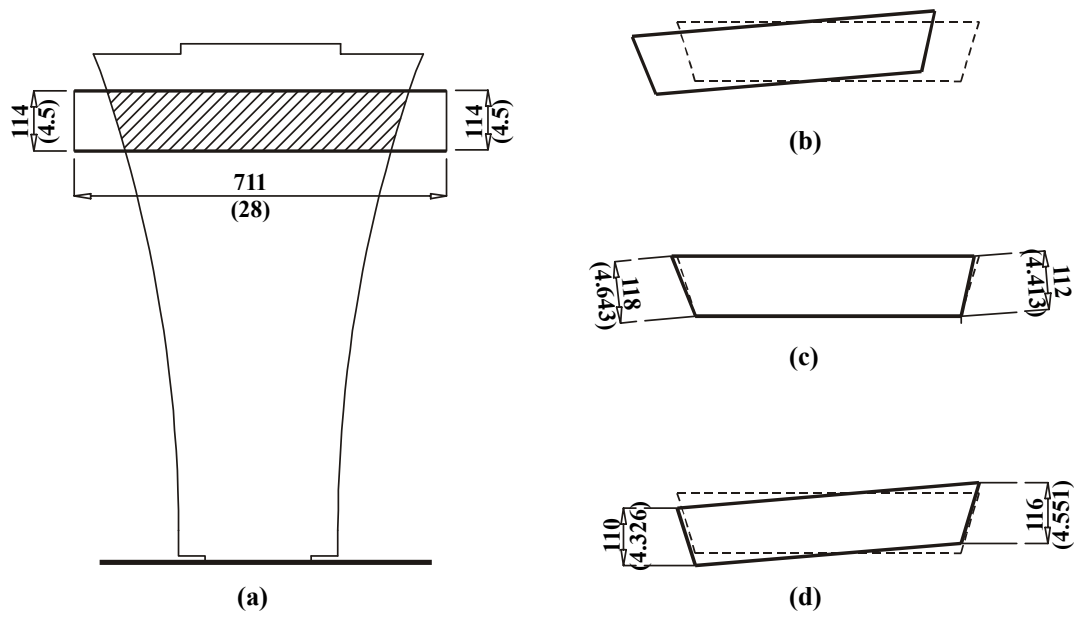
Curvature Calculations (a) Section 4 for East Column (b) Final Deformed Shape (c) Horizontal Deformations (d) Vertical Deformations
